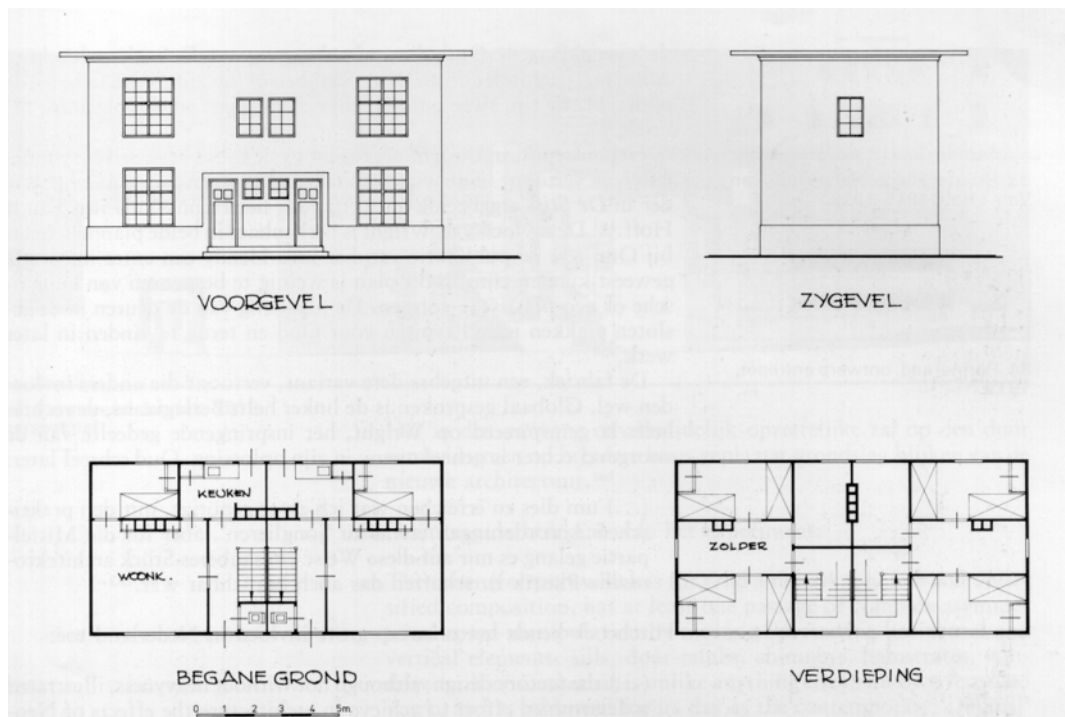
Second Double Workers' Housing in Reinforced Concrete, 1918, façades & plan layout
